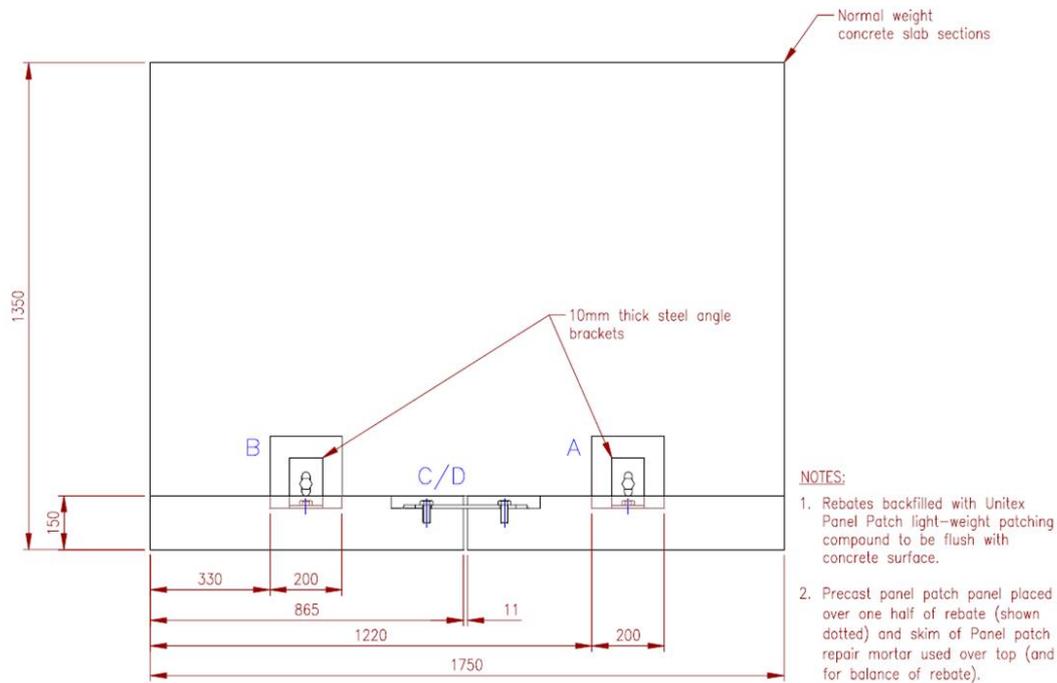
Concrete slab joint construction detail (2) as tested in WFRA 40938
